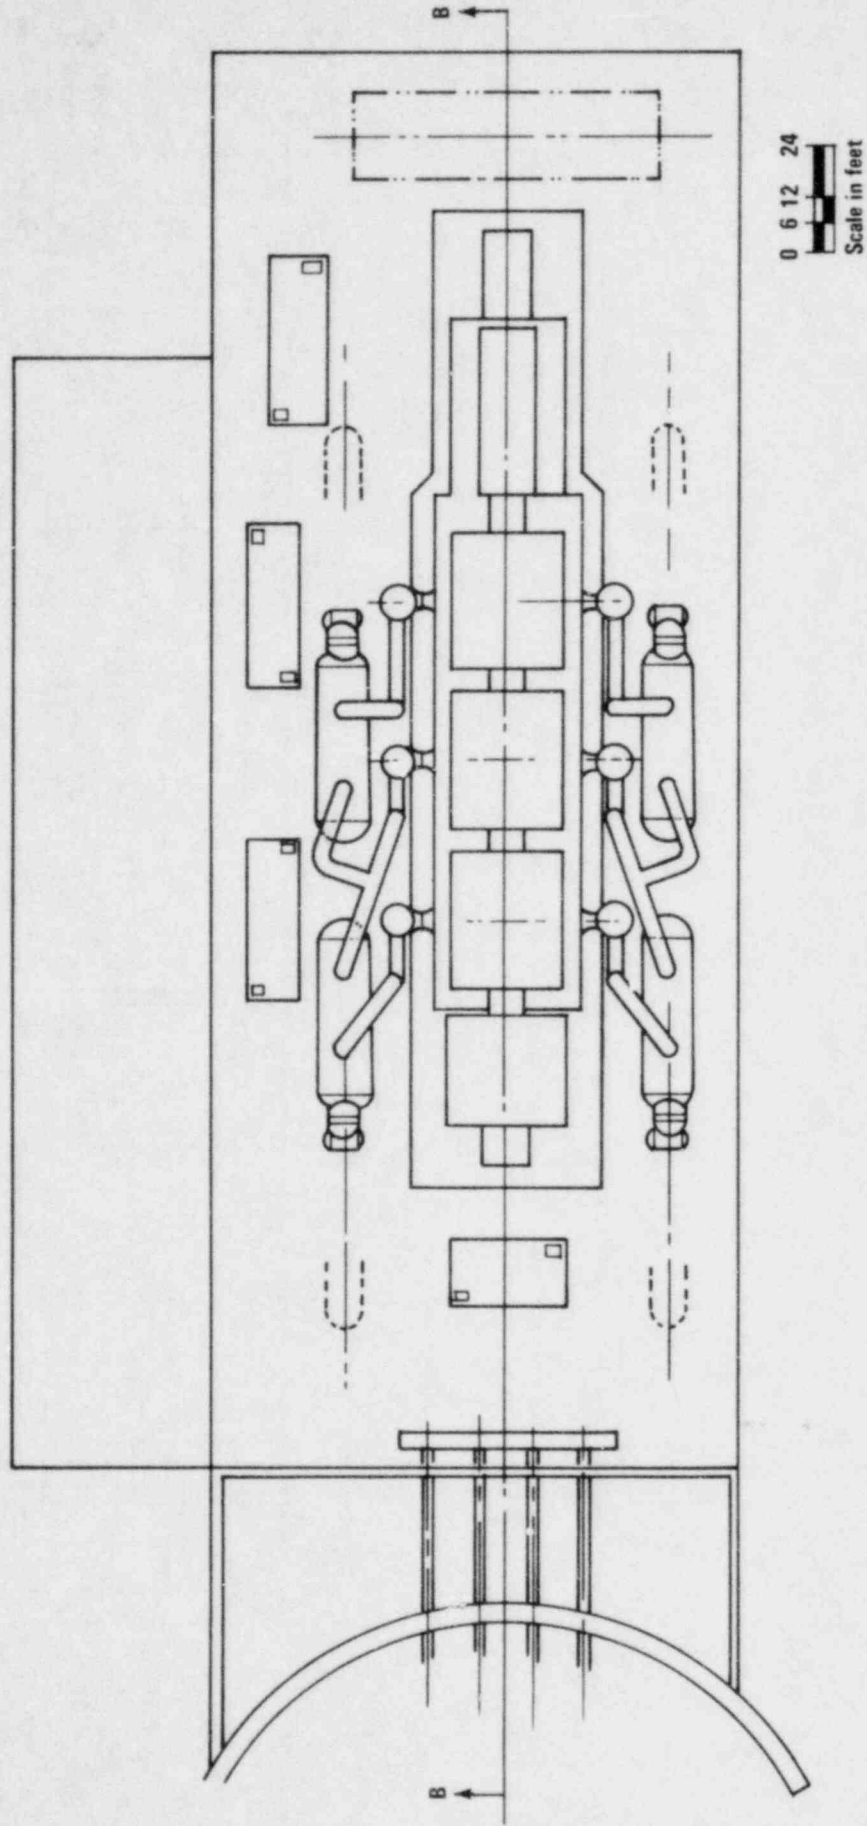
General arrangement of safety-related structures; elevation 79 ft-3 in.
